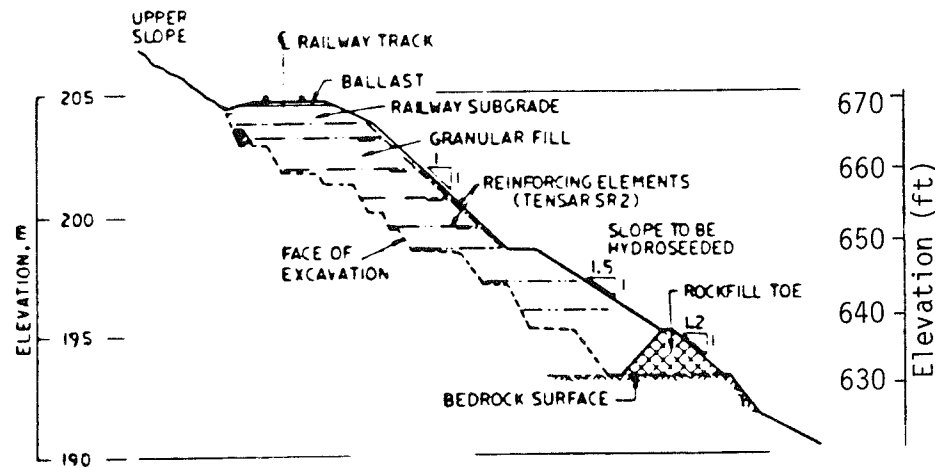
Slope failure repair at Waterdown, Ontario, Canada. [Busbridge, 1984]
